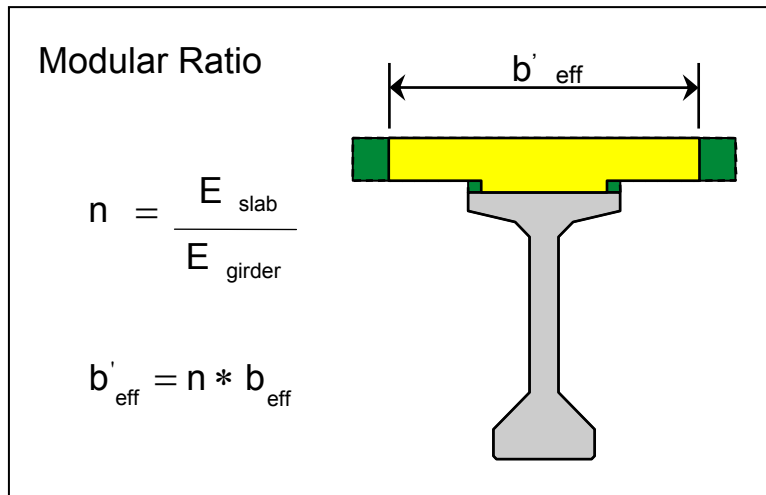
Modular ratio (n) of elasticity of slab to girder concrete
